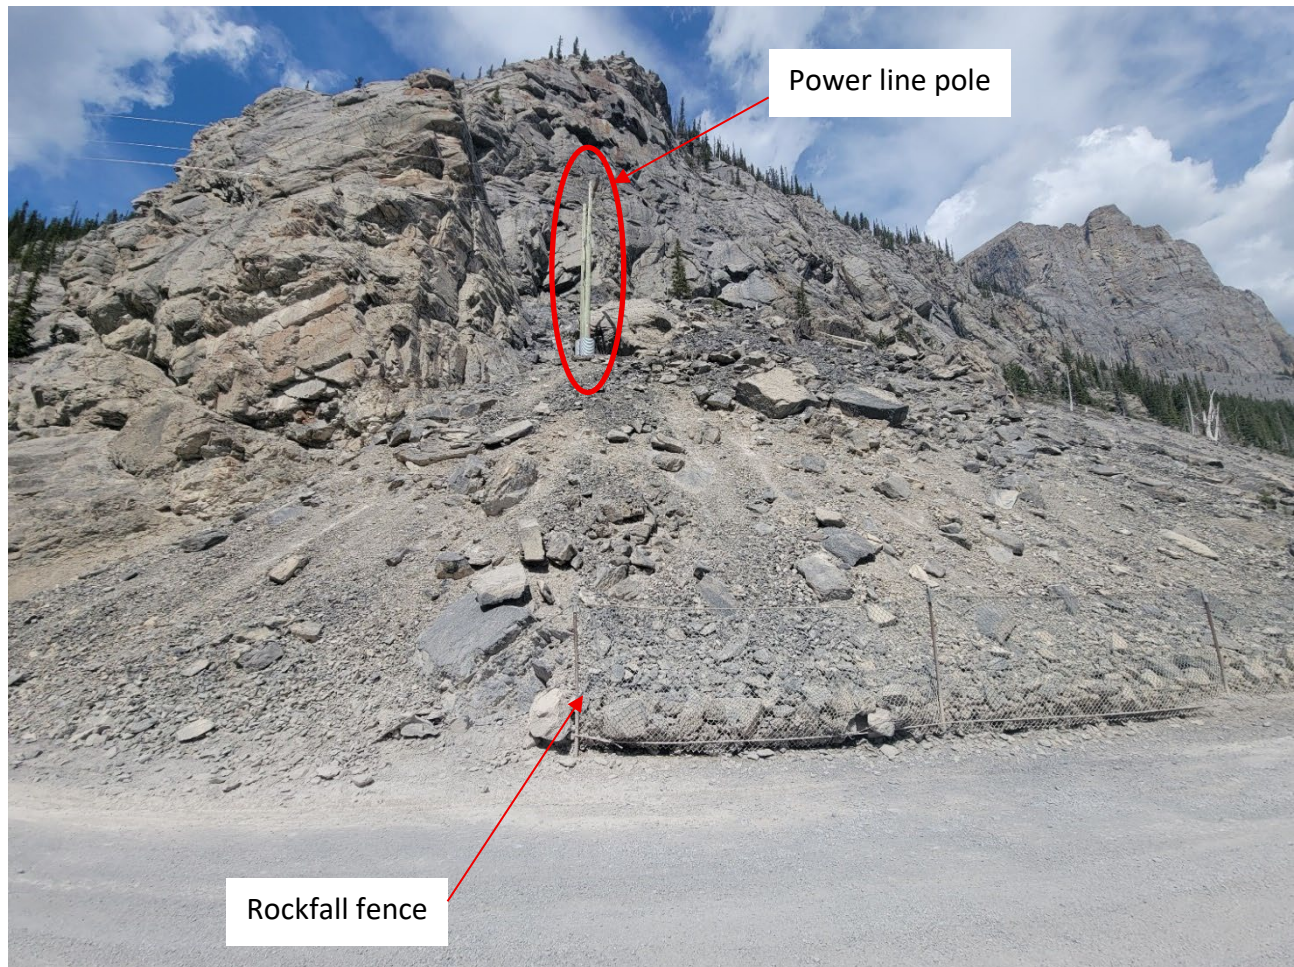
Rock slope and talus deposit up to the toe of the slope on the north side of the site.
